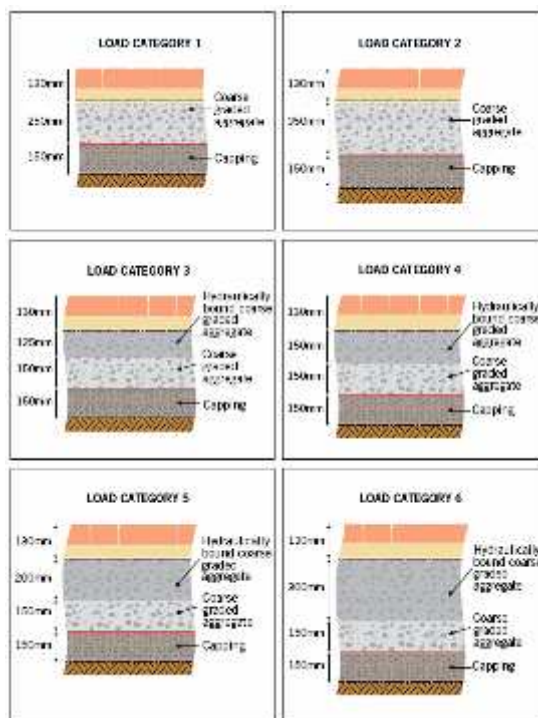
UK recommended pavement sections for tanked pavements according to traffic levels. The waterproof membrane is installed directly above the Capping layer.
